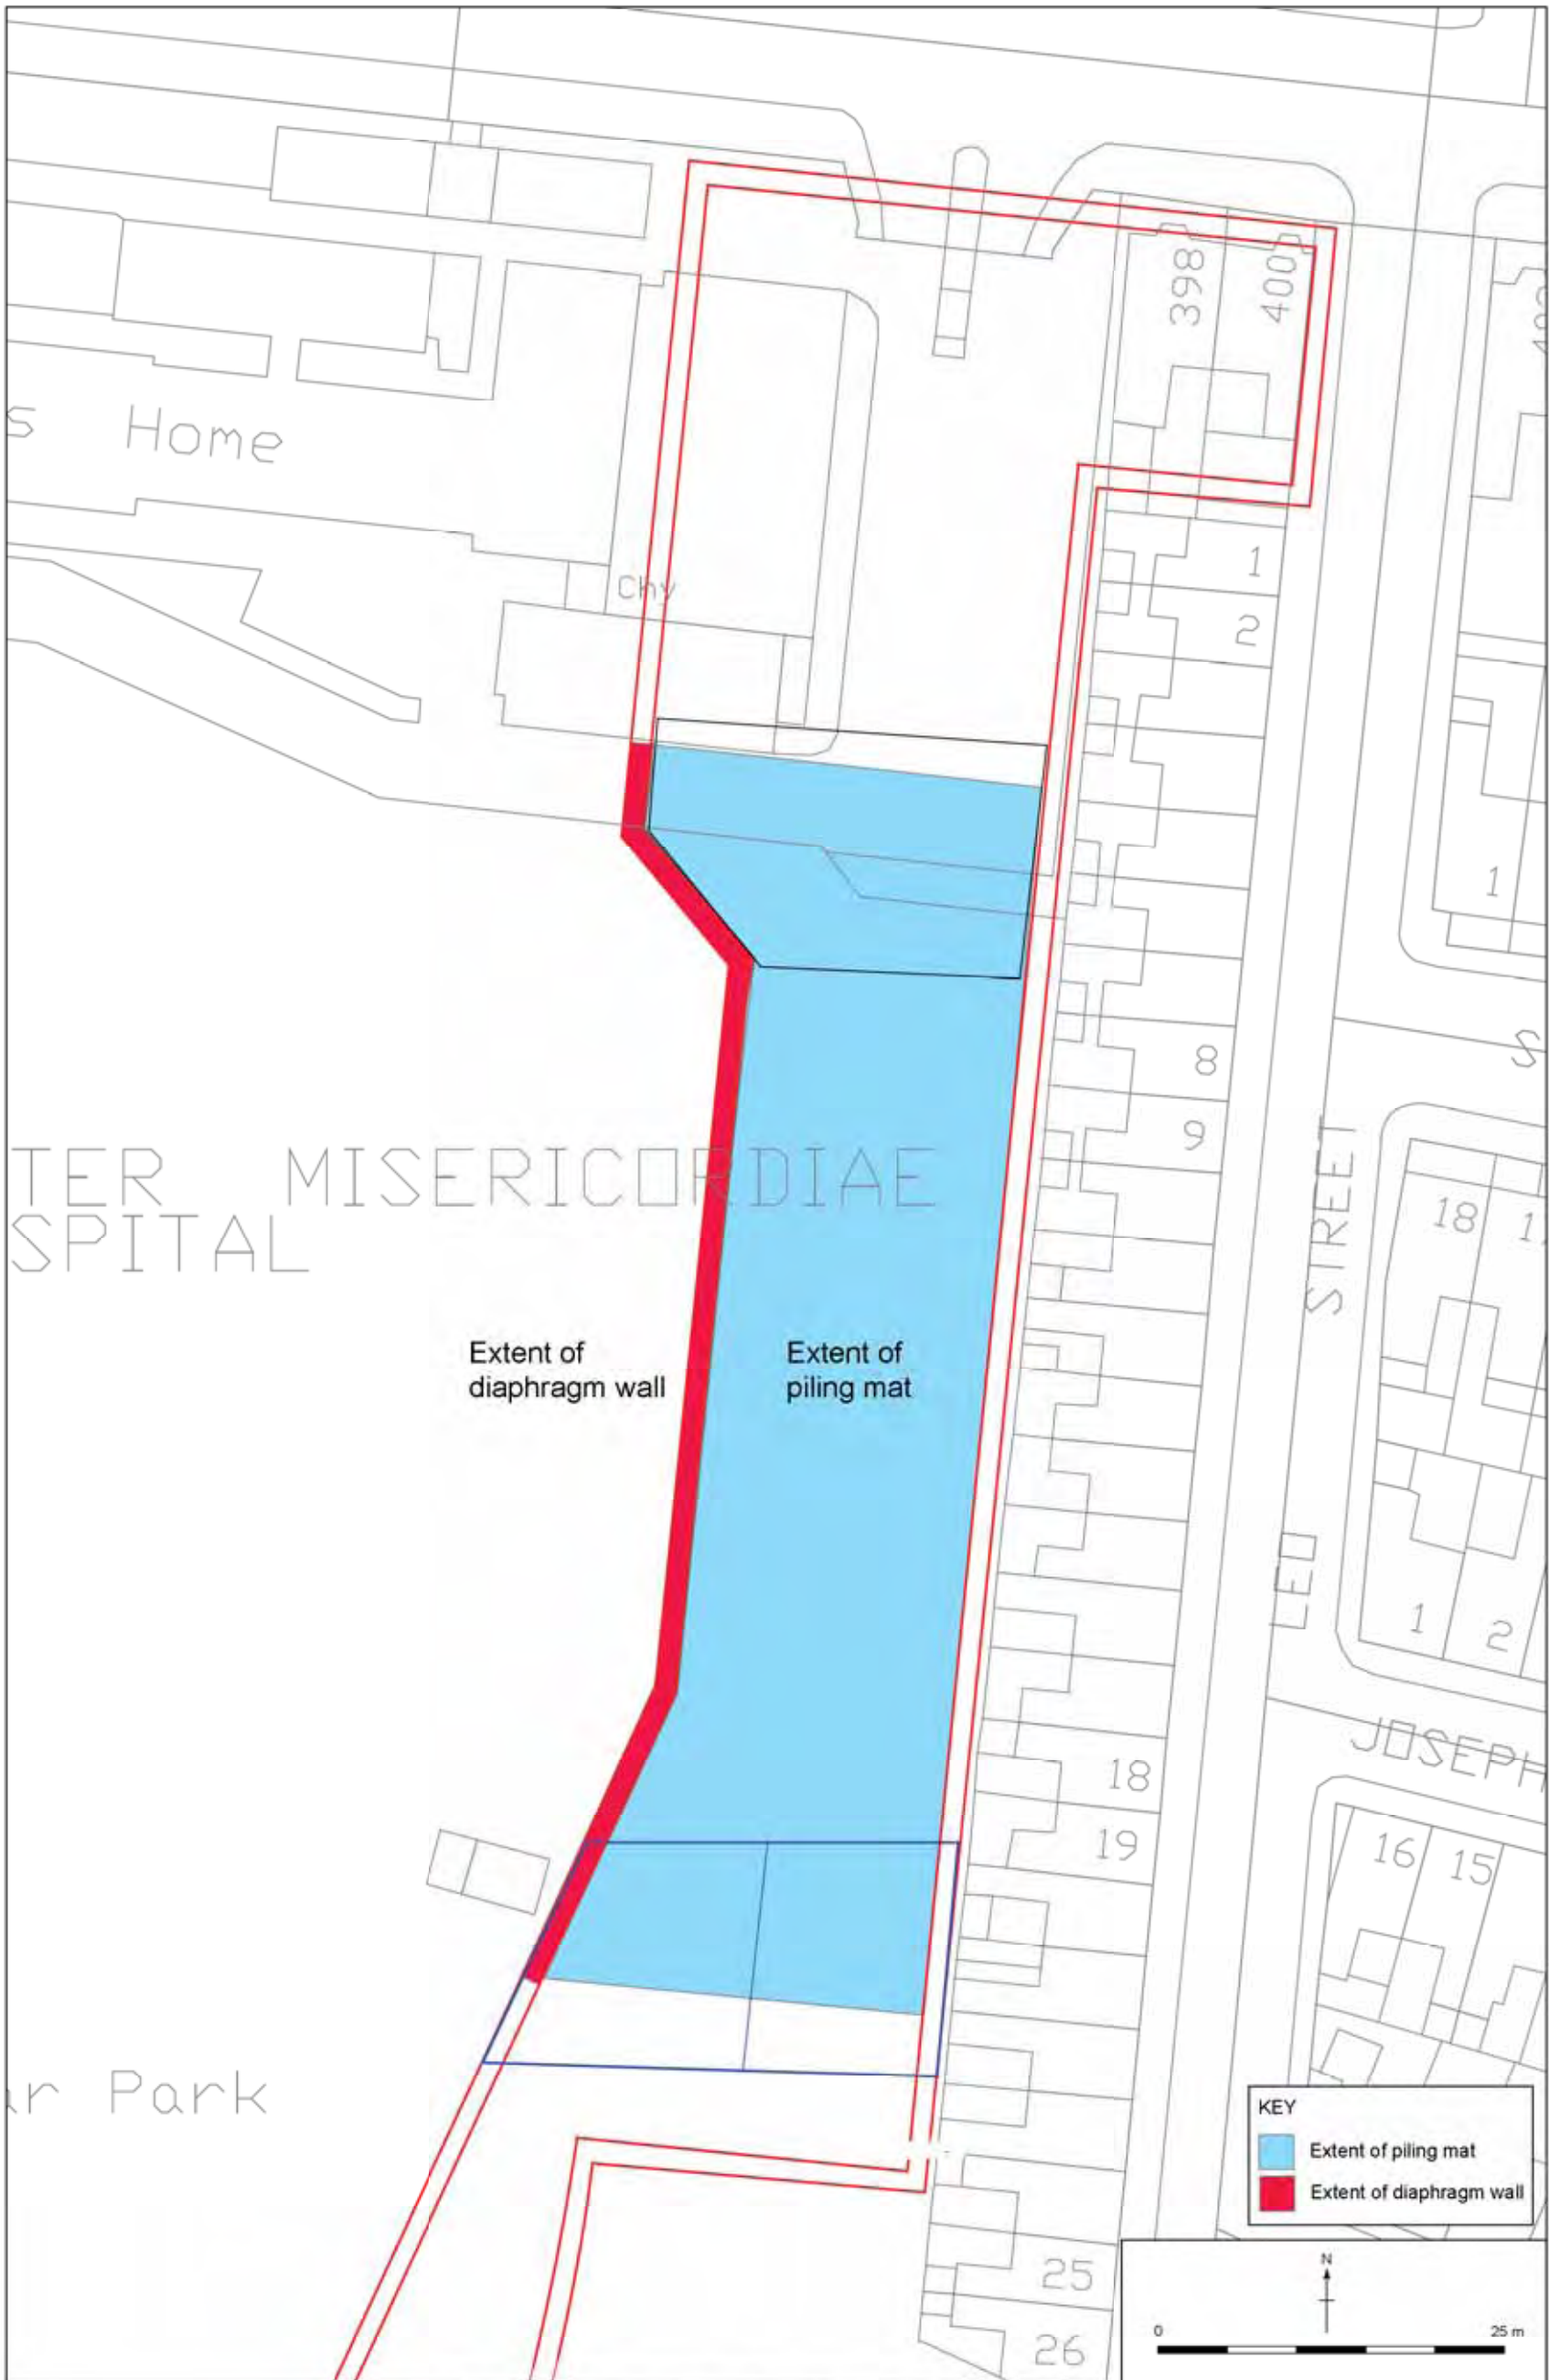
Metro North Mater Stop Box, Co. Dublin: Extent of piling mat and diaphragm wall.
